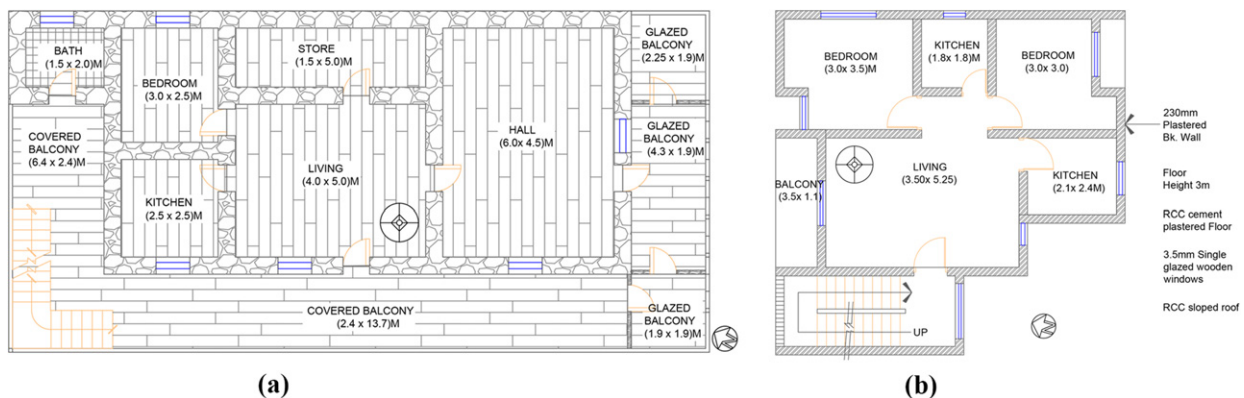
Plan of (a) traditional house (b) contemporary house in Naggar (CZ9).
